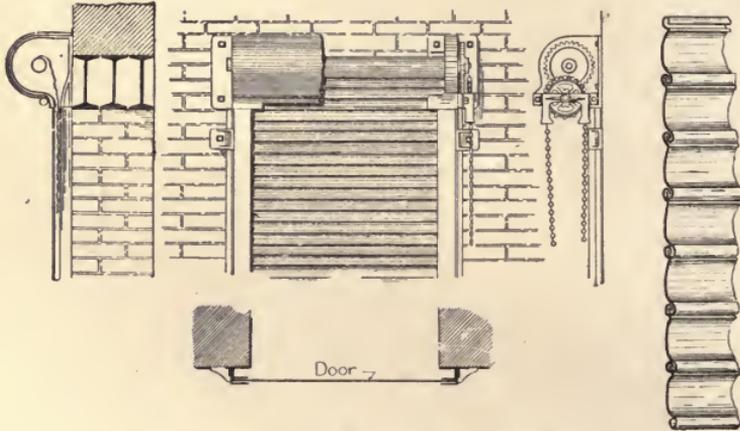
Detail of Rolling Door of Corrugated Steel.
